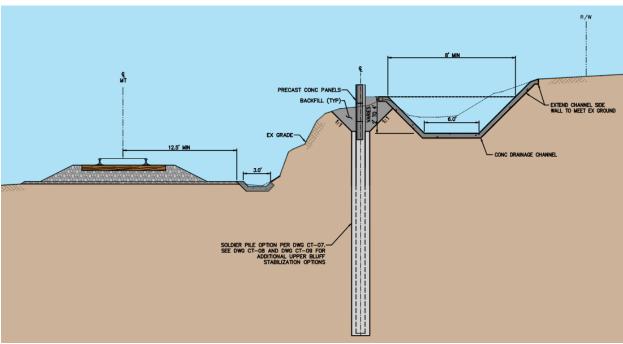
Drainage Area 5 Section – Soldier Pile Wall
